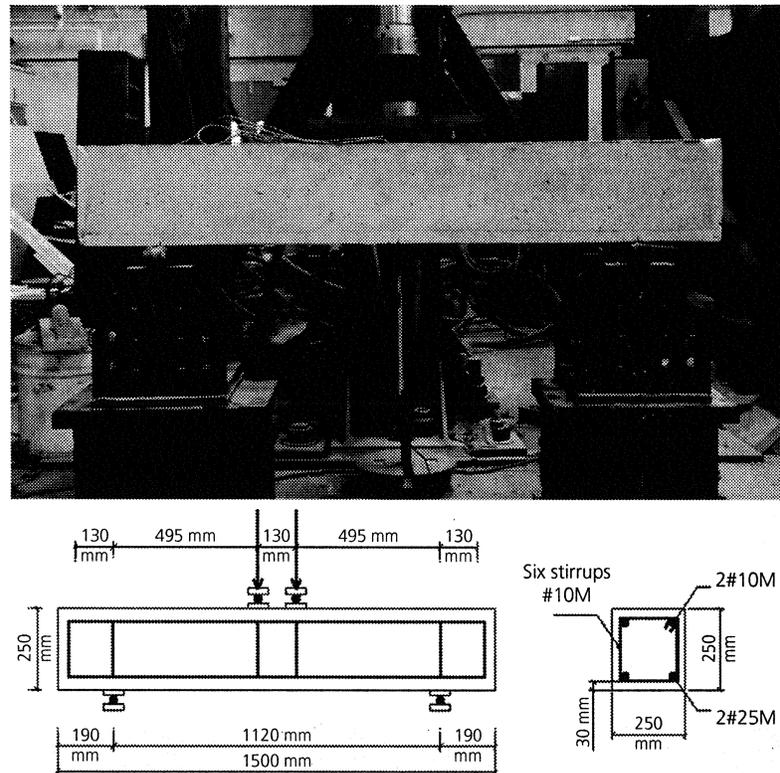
Typical test setup, dimensions and reinforcement of tested beams
